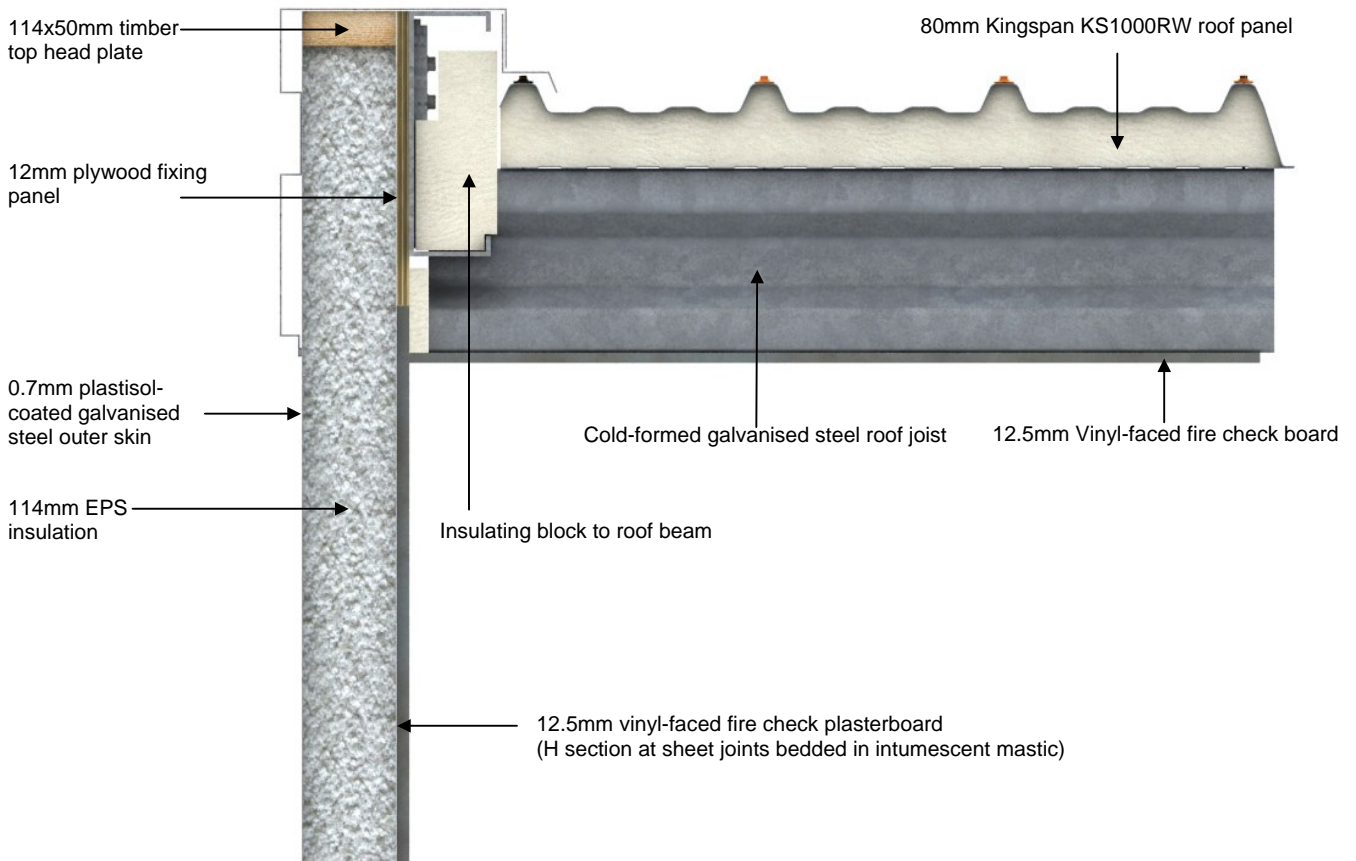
Roof, Wall and Floor Details for 114mm Wall Construction
